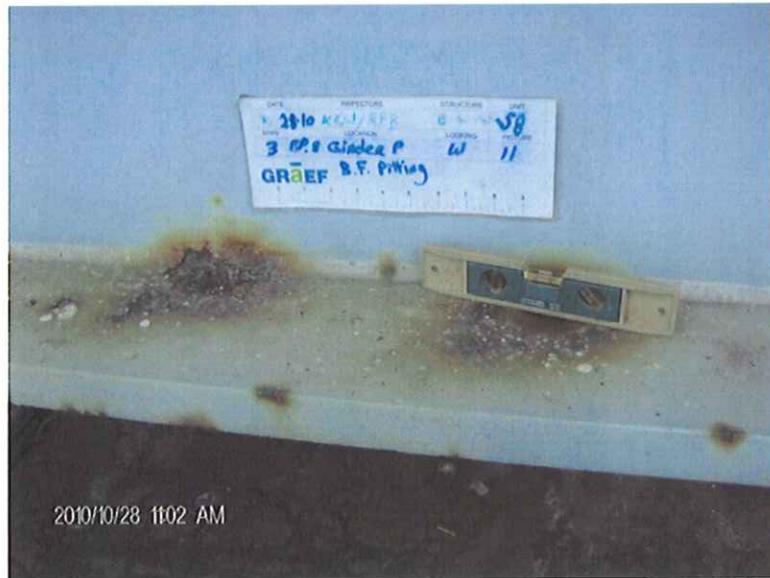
Fascia girder in multigirder approach spans – bottom flange pit due to corrosion
